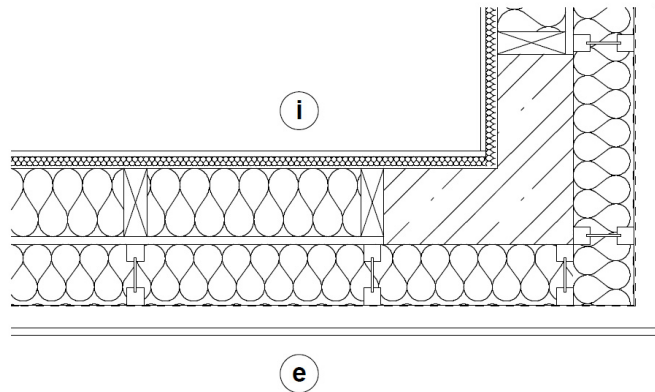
The critical detail of the corner exterior walls of composite construction.
